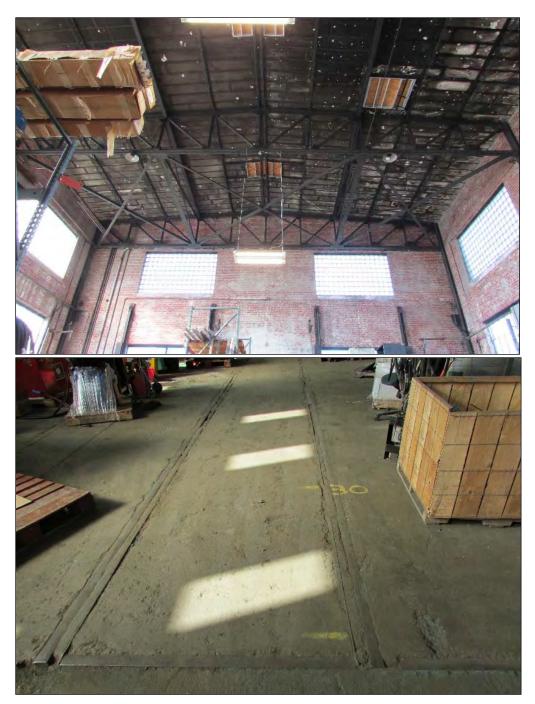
ROOF STRUCTURAL SYSTEM DETAIL, FACING SOUTHWEST (TOP); DEFUNCT TRACK LINES, FACING SOUTHWEST (BOTTOM)
